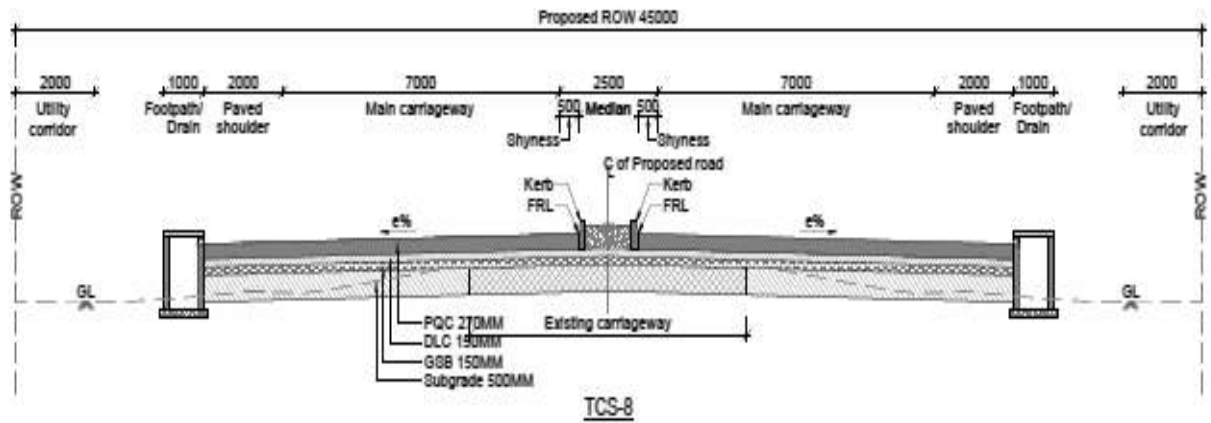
TCS-8 Typical cross section of 4-laning by concentric widening With 1.5m raised median for restricted row
